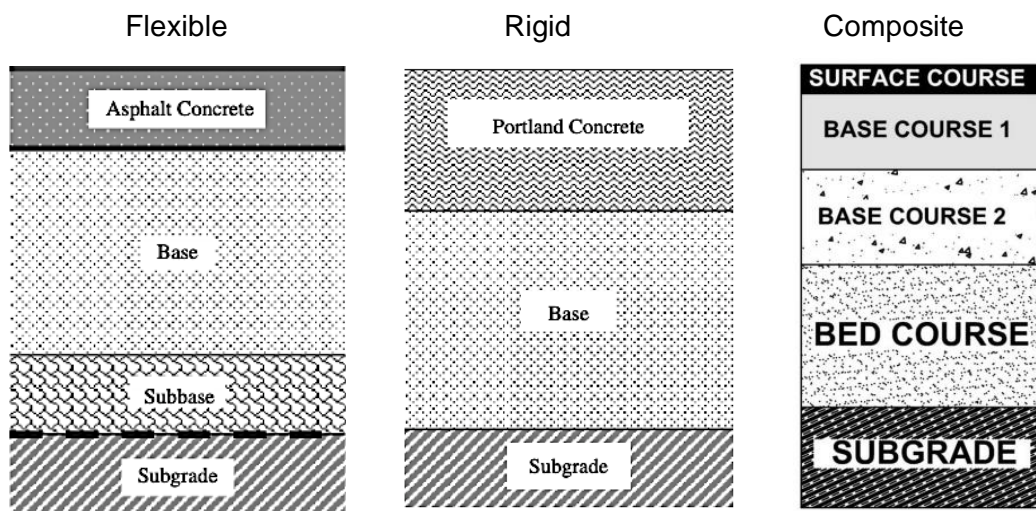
11. Typical pavement types (Papagiannakis & Masad, 2007; Mezhoud et al., 2017)
